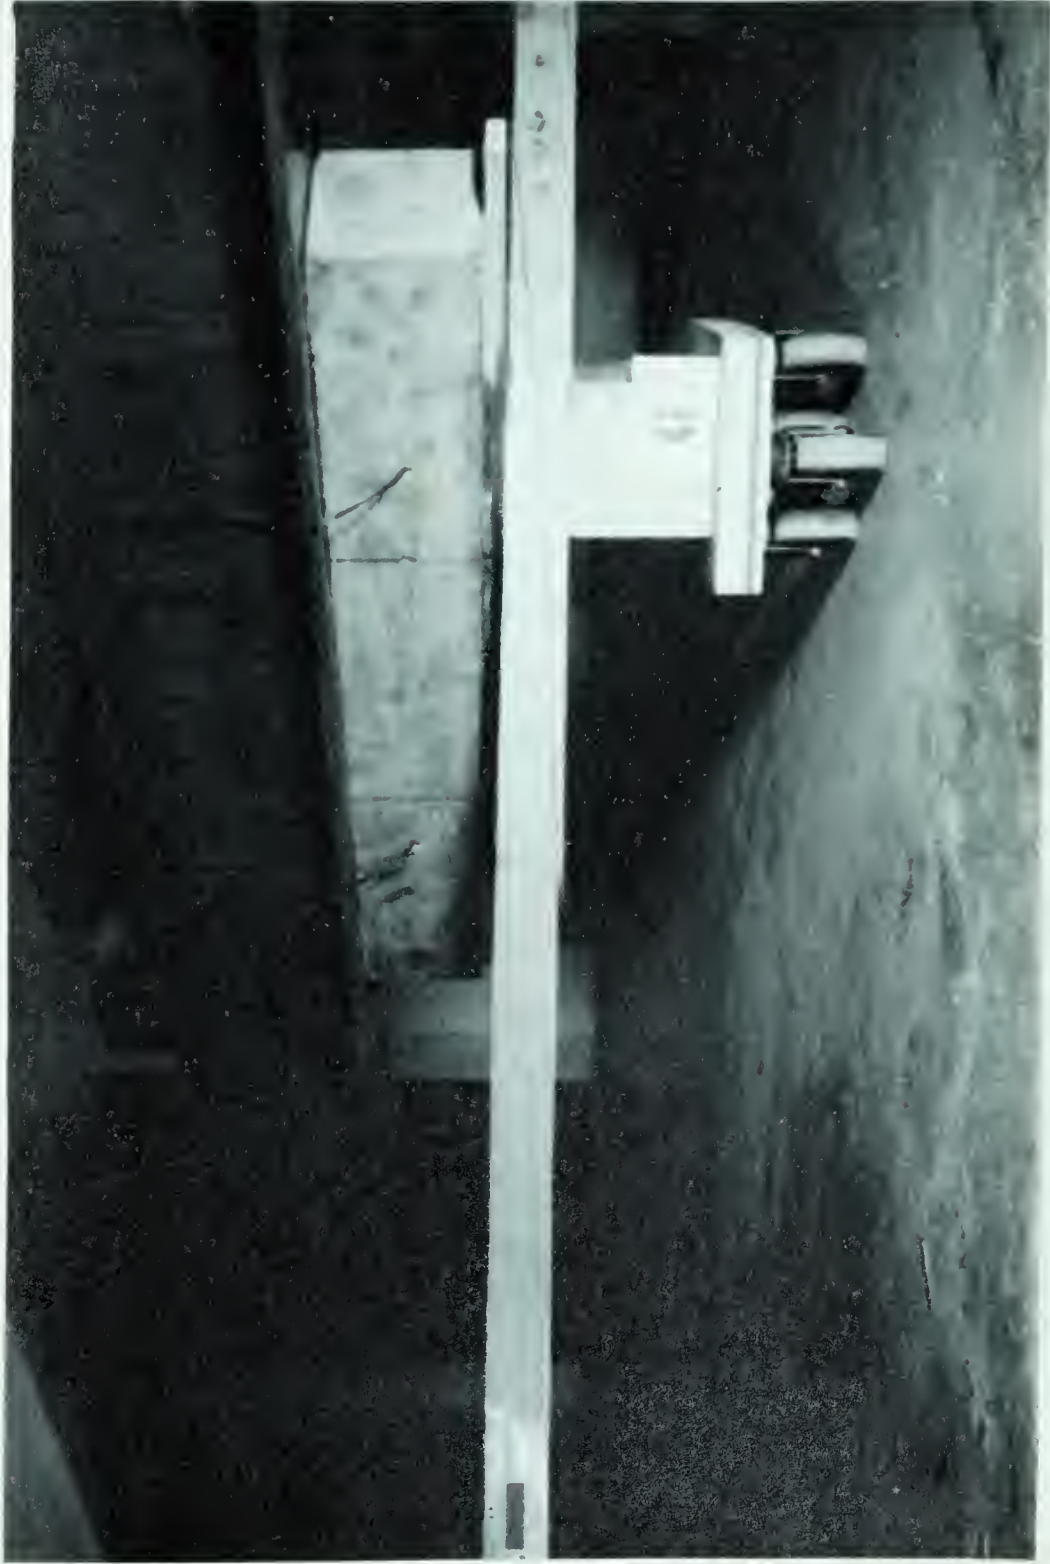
View of Failure in Arch Specimen No. 6.
